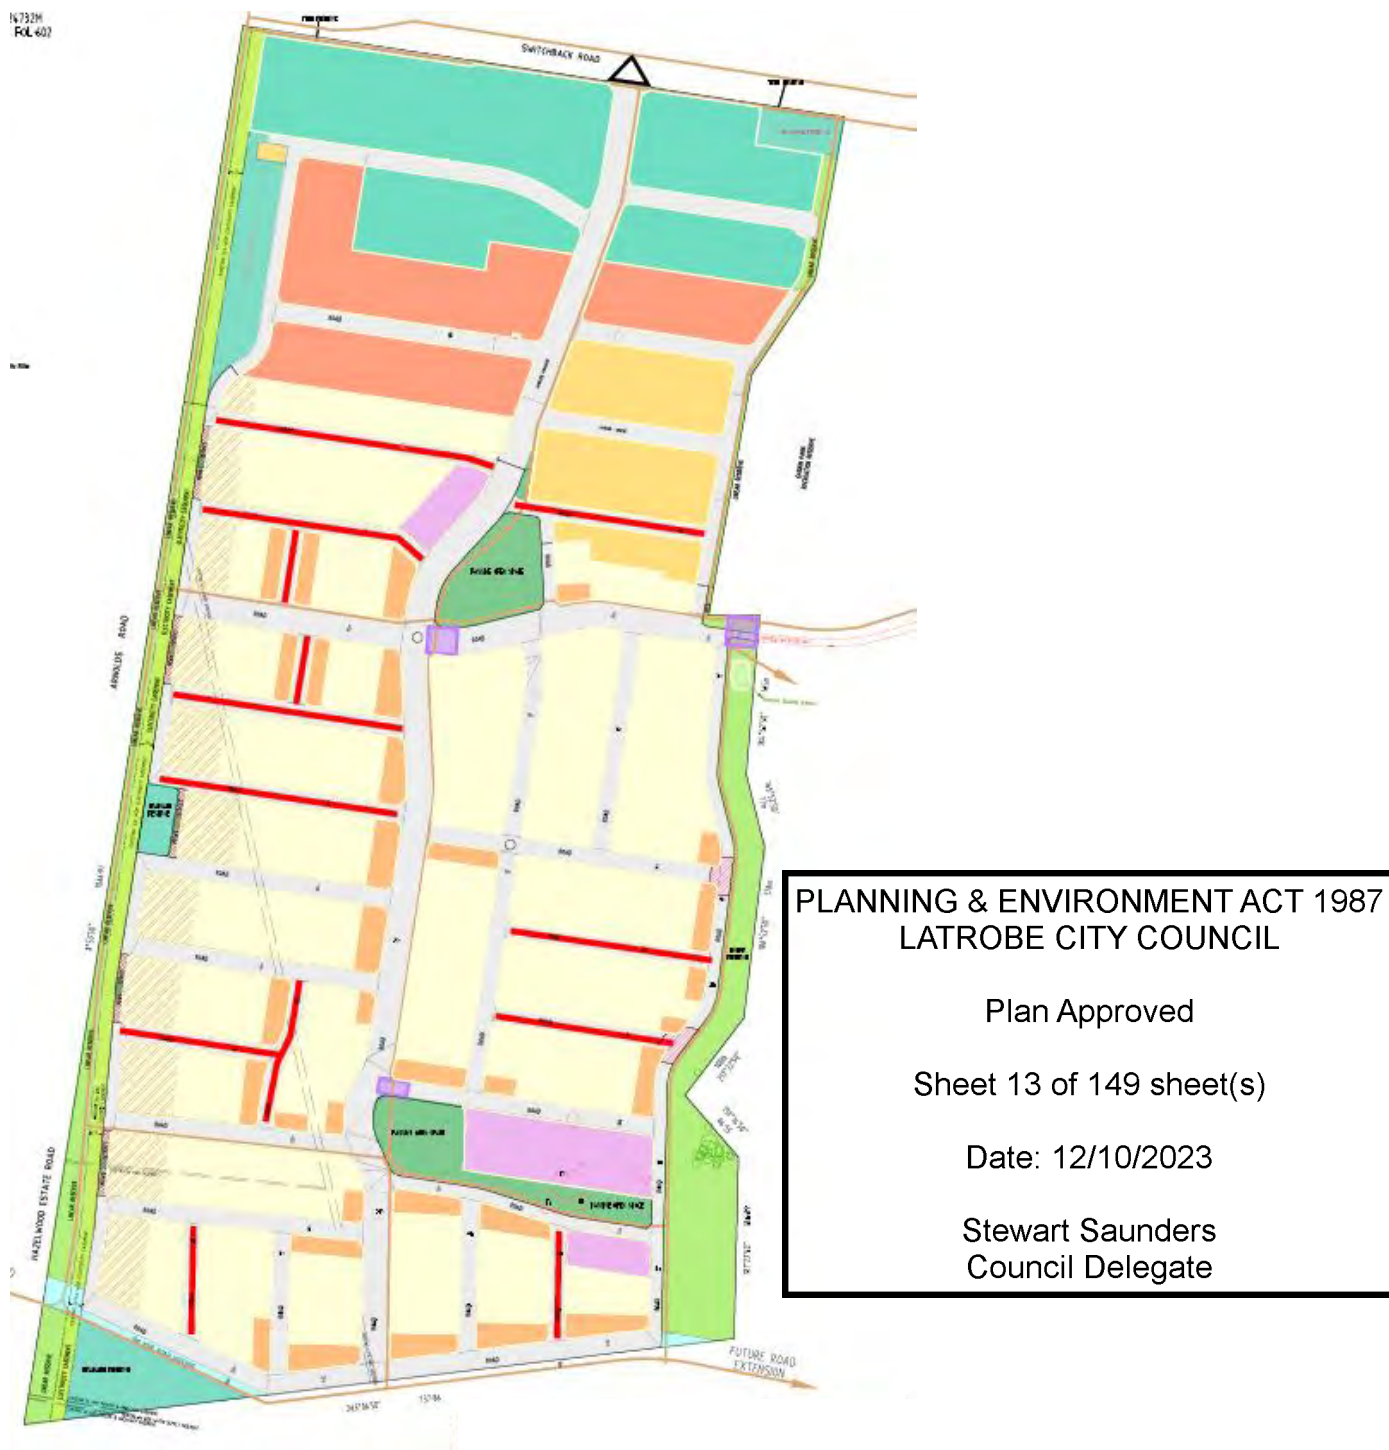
Indicative plan of which access 1 street have been narrowed from 18 metres to 16 metres.
